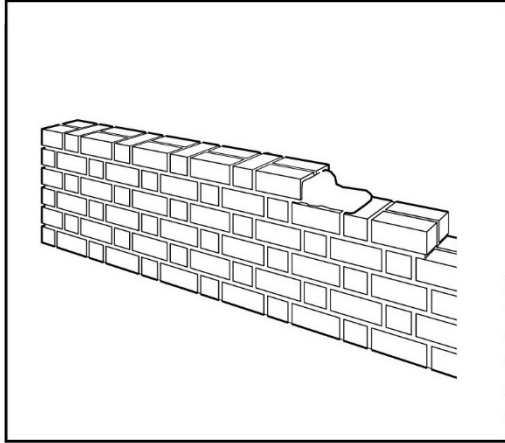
Process with alternating rows, flemish bond (walls of 1 foot)
